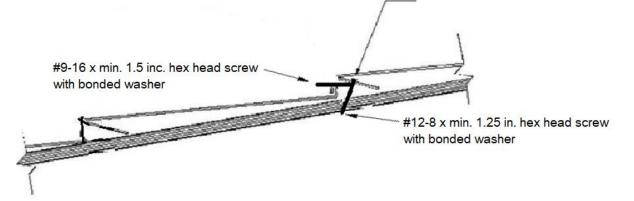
Direct to Deck Installation Detail (Systems 7 & 8)
